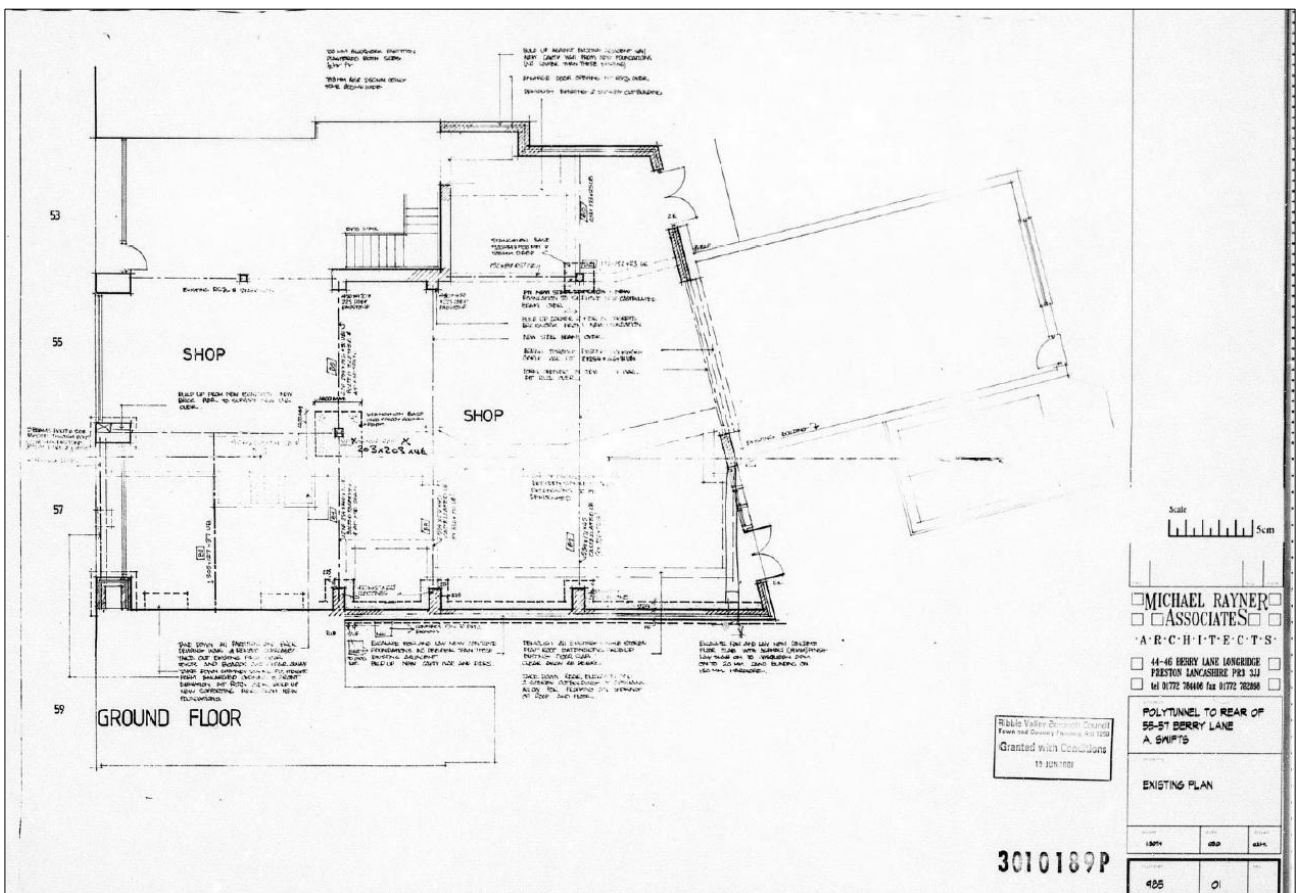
Existing ground floor plan 985-01 of 53-57 Berry Lane. 2001
